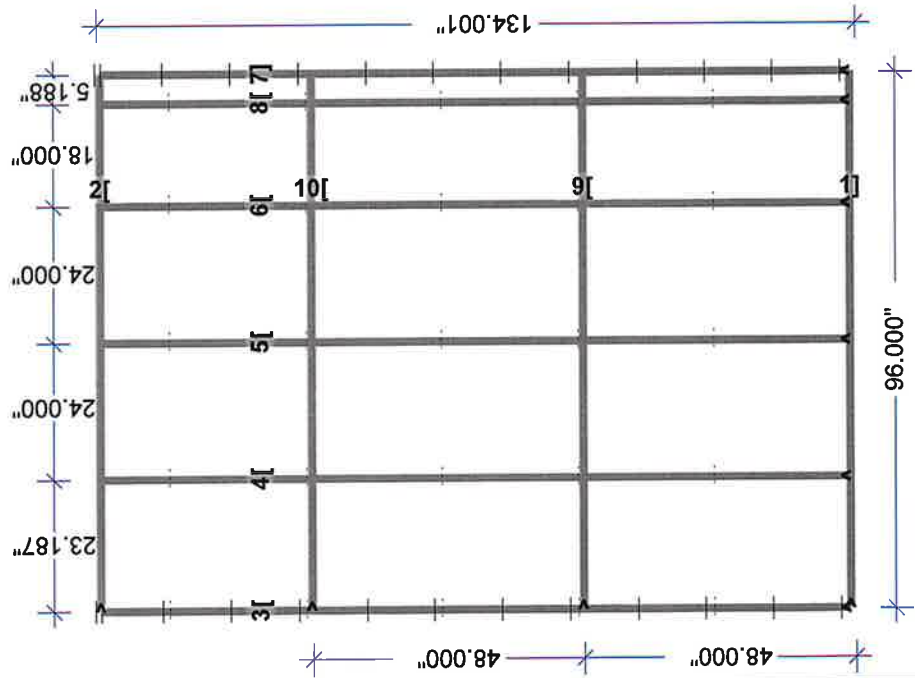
Height	134.001"	Length	36.000"	Screws	32
